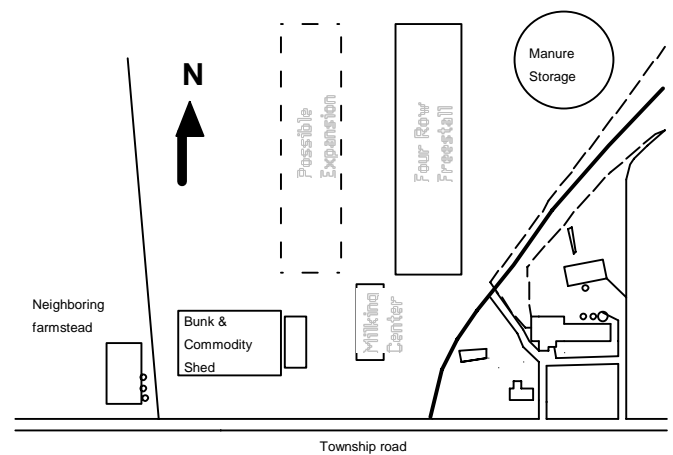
Proposed layout of new facilities, with additional expansion, in relation to the existing farmstead.
